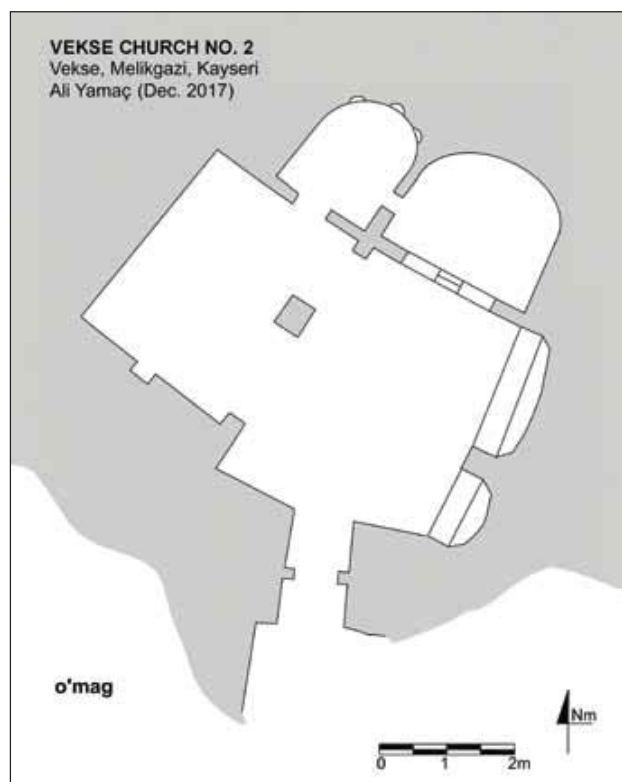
Plan of Vekse Church No. 2 (drawn A. Yamaç).
